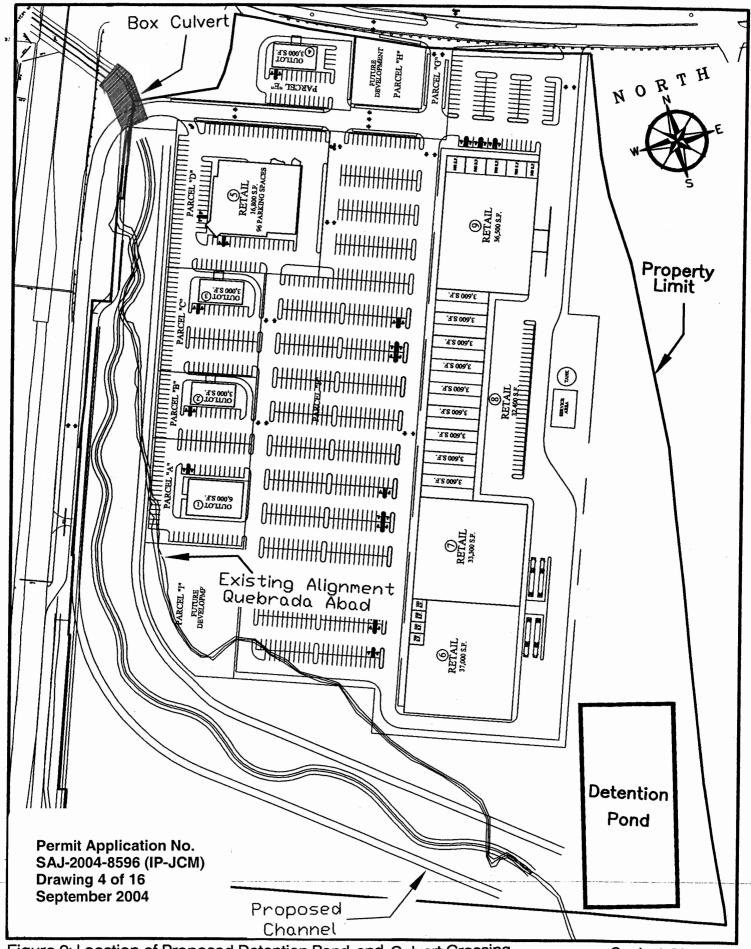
Location of Proposed Detention Pond and Culvert Crossing
